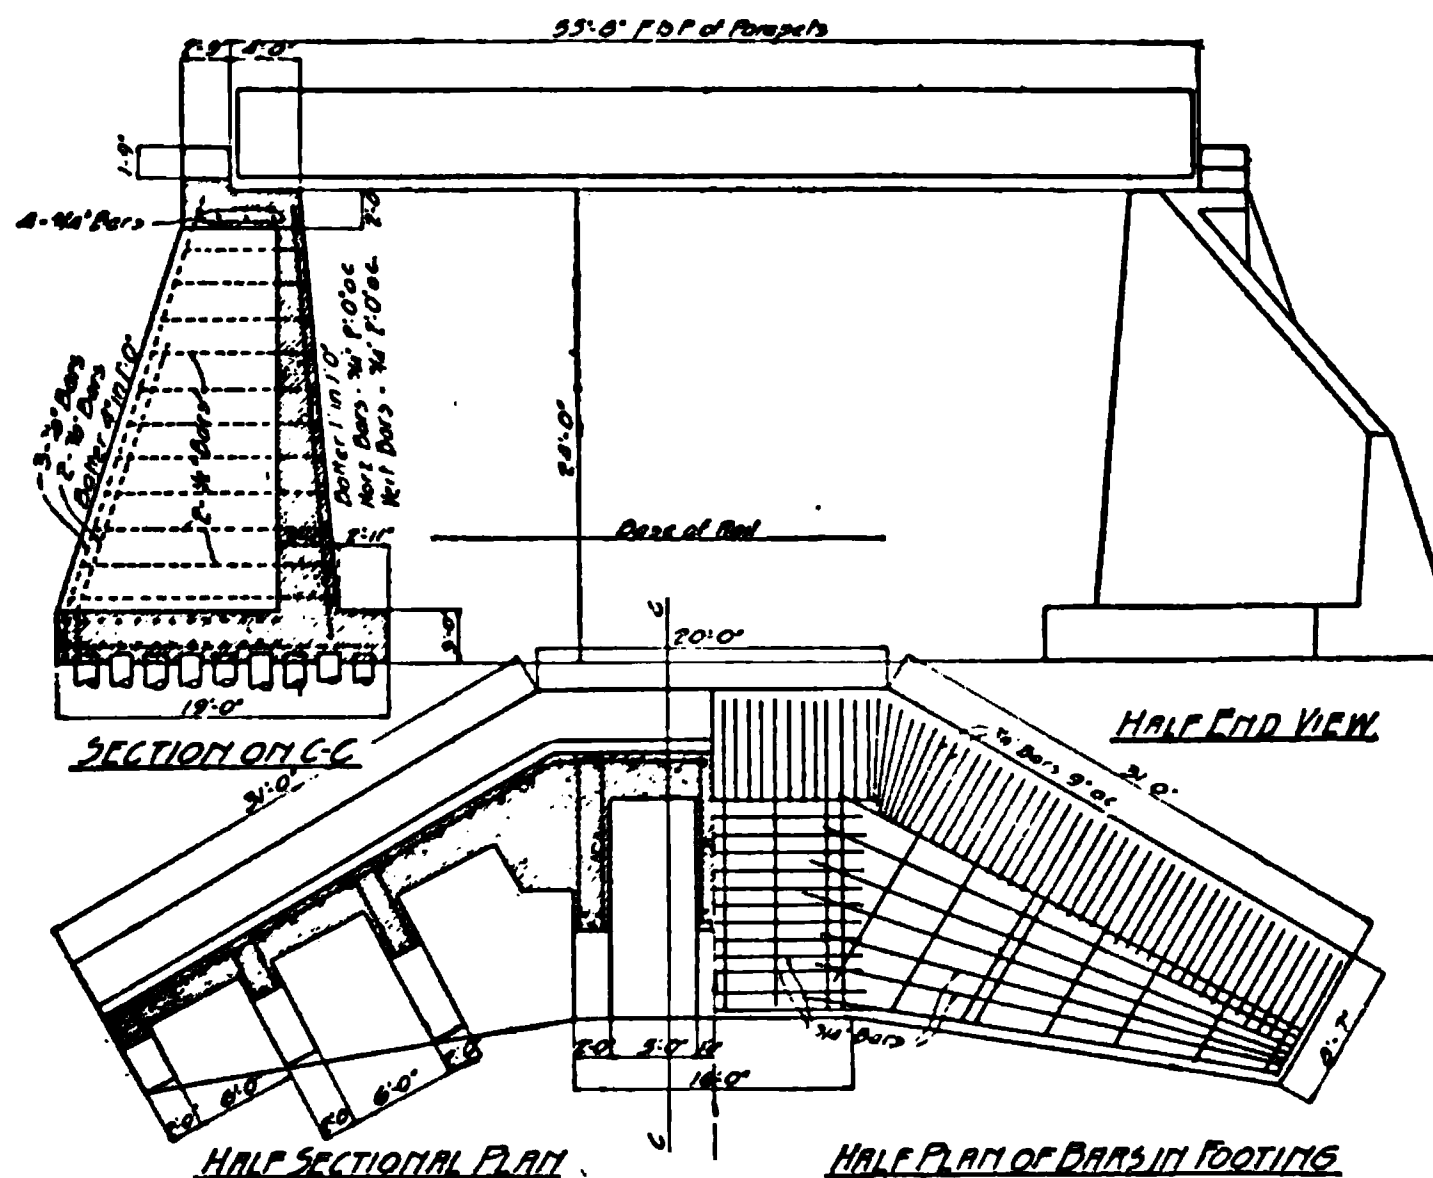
REINFORCED CONCRETE RAILWAY BRIDGE ABUTMENT, C. B. & Q. R. R.
